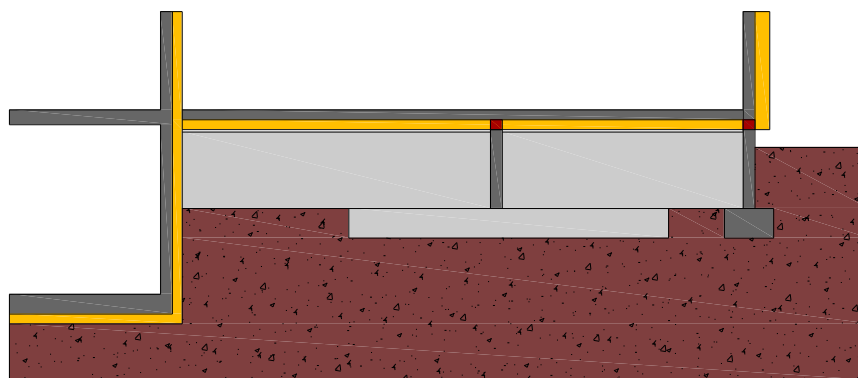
Thermal separation of the basement walls by means of foam glass panels, Schul-Pavillon Walldorf / Architecture: IB W. Herrmann, Walldorf.
